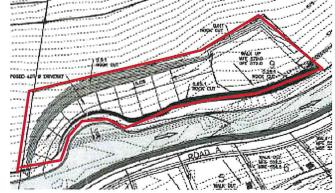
Proposed R1 Portion of Split Zoned Lot
